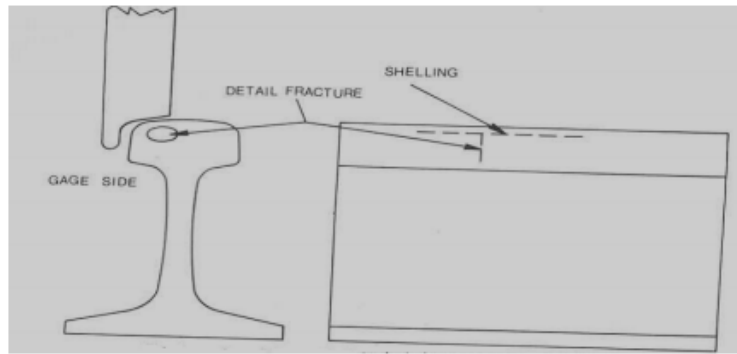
5. Schematic of wheel/rail contact showing shelling and detail fracture [38]
